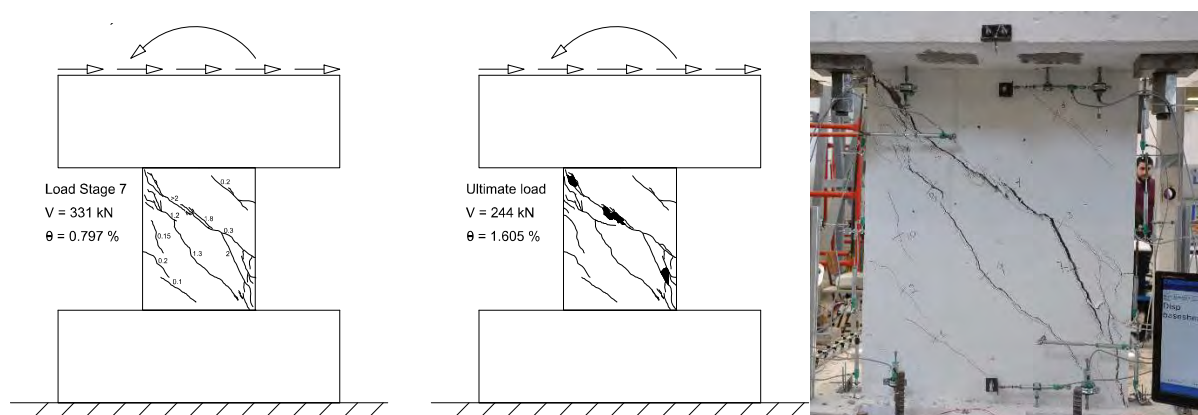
Crack diagrams of specimen RB3: at Load Stage 7 (left) and failure (middle). RB3 specimen's post-test photo (right)
